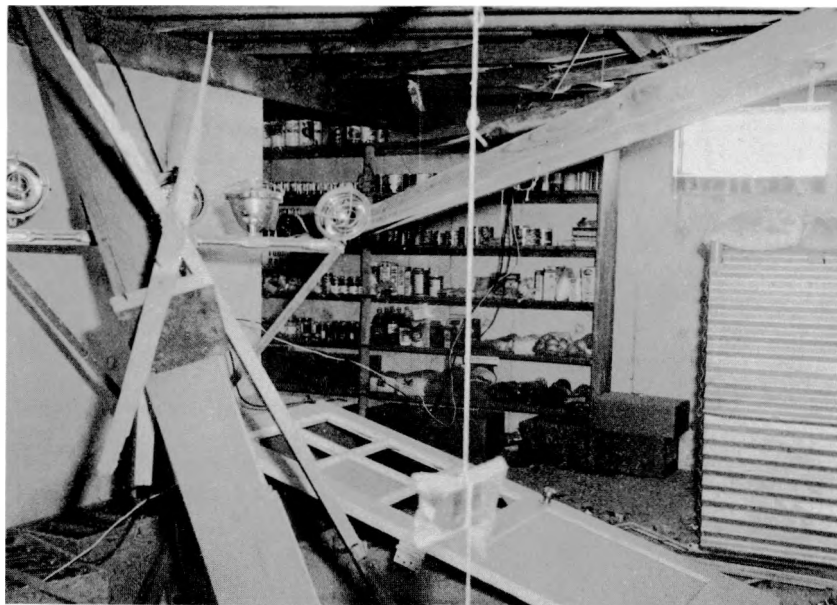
Produce, staples, and canned foods still on shelves in basement wreckage of frame house at 5500 ft. Most foods were undamaged in the basement.
